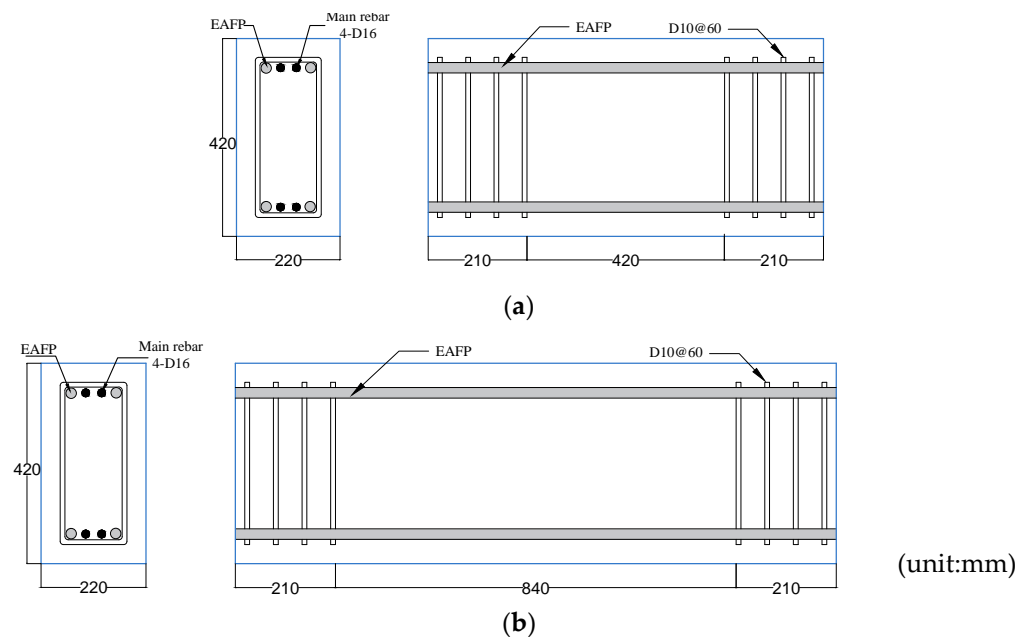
Rebar arrangement of monitor specimen: (a) short specimen; (b) long specimen.
